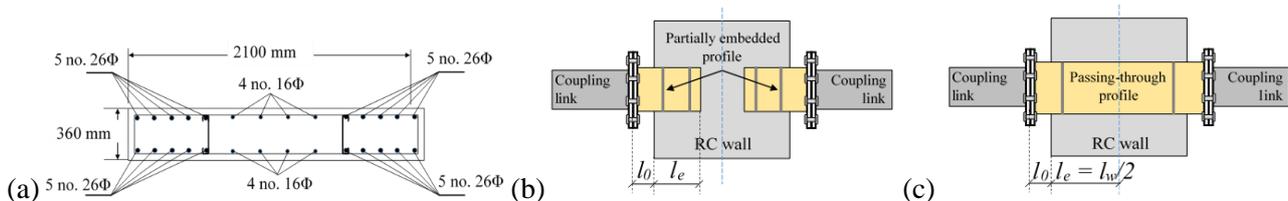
(a) Reinforcement detailing for RC wall of the 6-storey HCW system [3] and schematic diagram of (b) WC-1 configuration (c) WC-2 configuration
